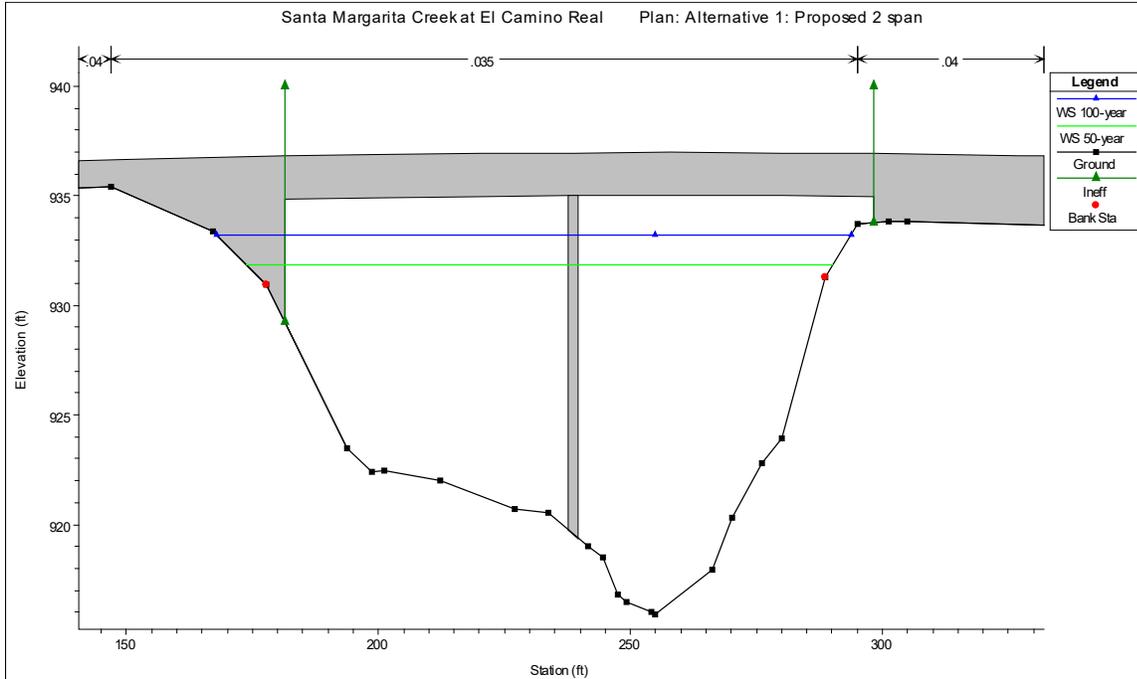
Alternative 1 – 122 ft, 2-span Bridge
